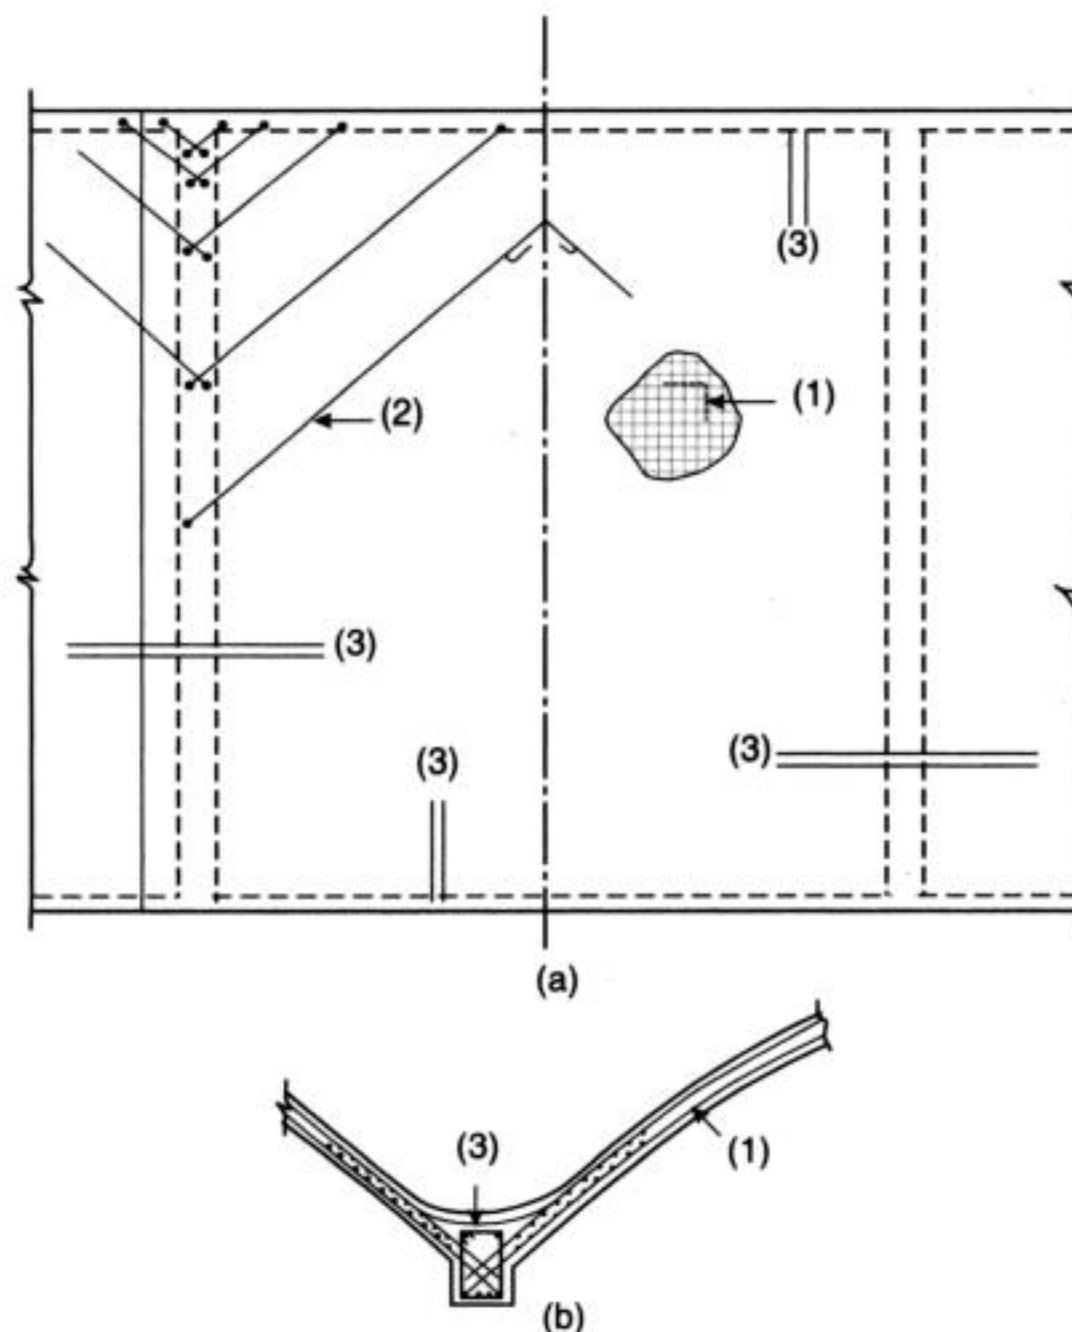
Detailing of steel reinforcements in conoids: (a) Plan and (b) Edge beam of multiple conoids. (1) Steel placed at top and bottom of shell both ways, (2) Diagonal steel, and (3) Extra steel placed at thickened edges.
